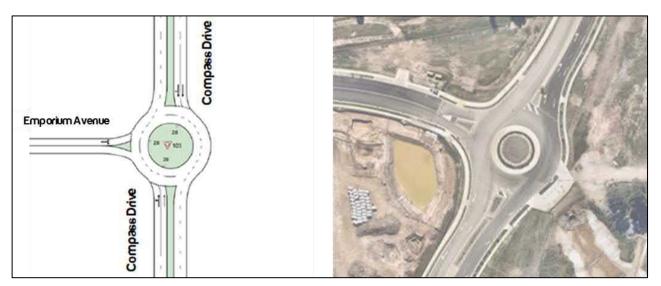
Intersection Layout of Compass Drive & Emporium Avenue
